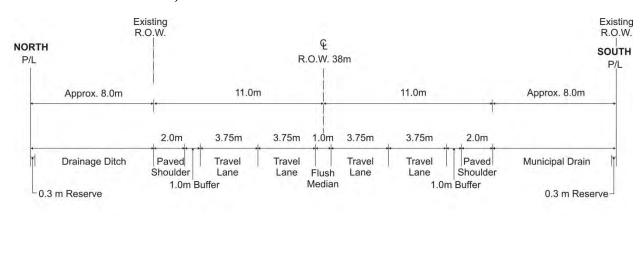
TYPICAL CROSS-SECTION COUNTY ROAD 42 STA: 19+100 to Sta: 20+000 (just west of the 9th Concession Drain culvert)
